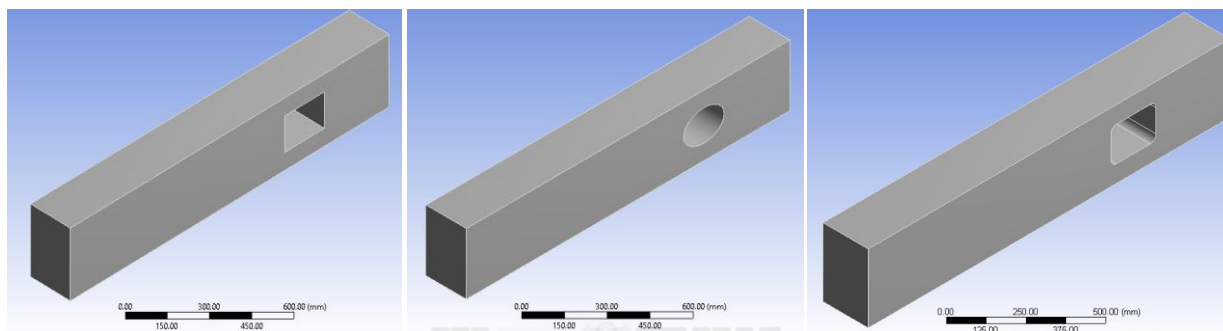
Model of (a) Rectangular opening (b) Elliptical opening (c) Rounded rectangular opening
